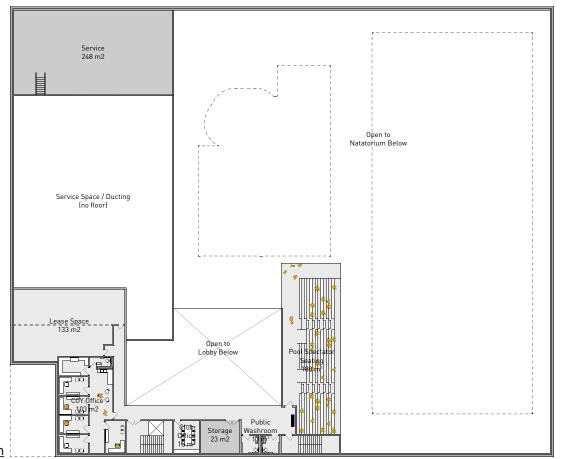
New Aquatics Centre Concept Design - 25m lane pool (with 8 lanes) Building Plan
